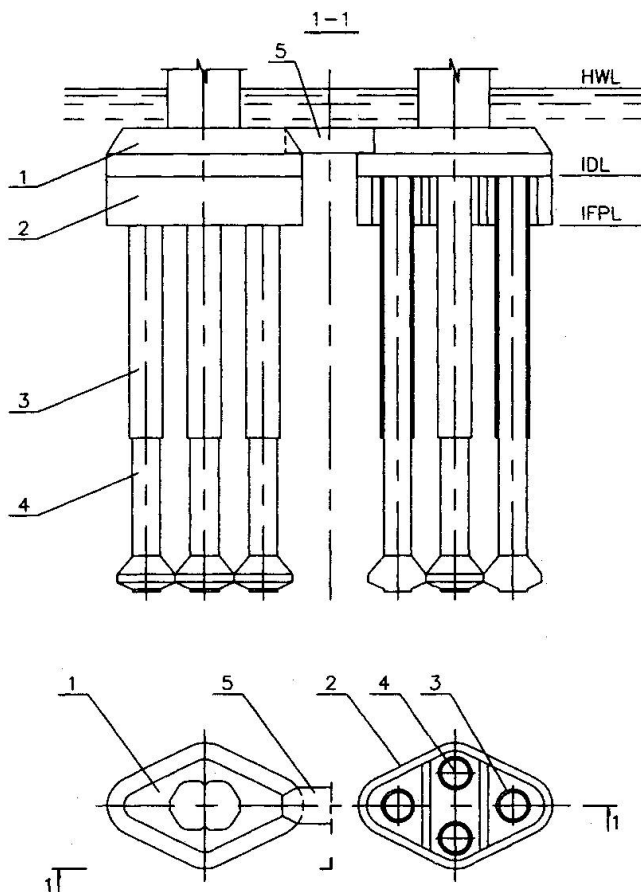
General arrangement of foundation: 1 – pile cap, 2 – ice protective shell; 3 – steel encasement; 4 – bored pile; 5 – strut; HWL – high water level; IDL – ice drift level; IFPL – ice first push level (min)
